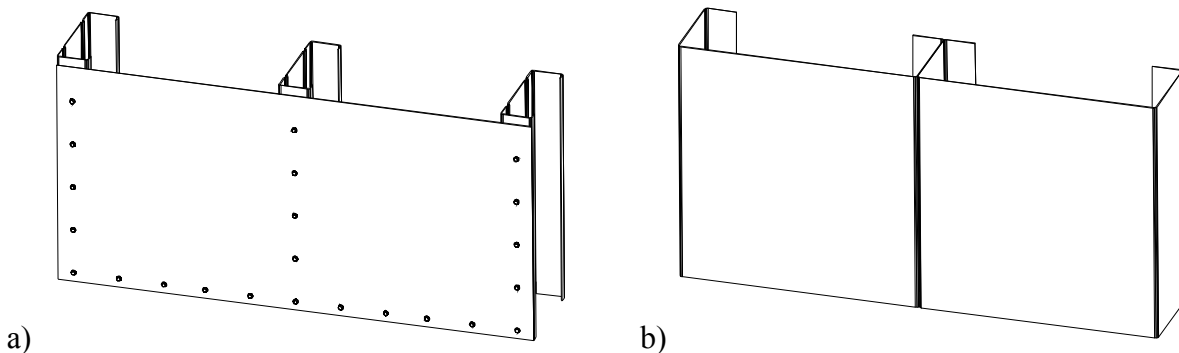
(a) Steel Skeleton Walls with Flat Steel Sheathing and (b) Cassette Section Walls
